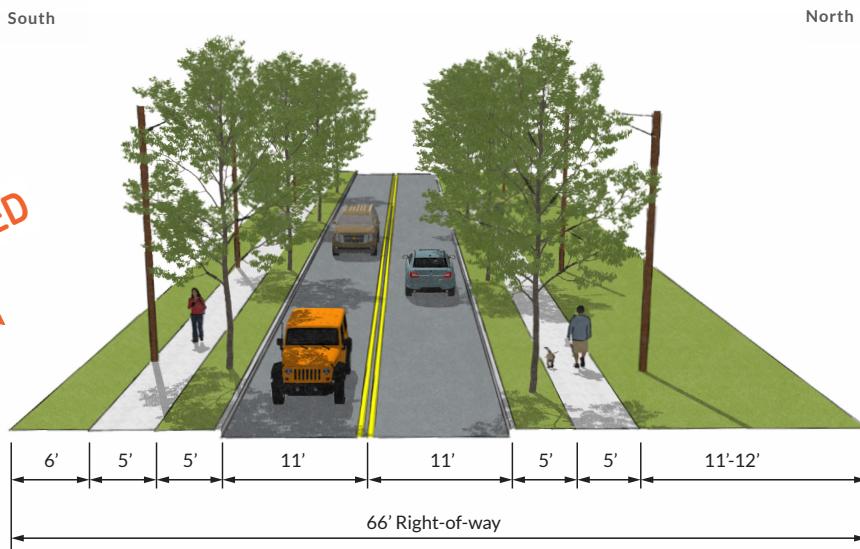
Ridge Road Streetscape Alternative A - Preferred
